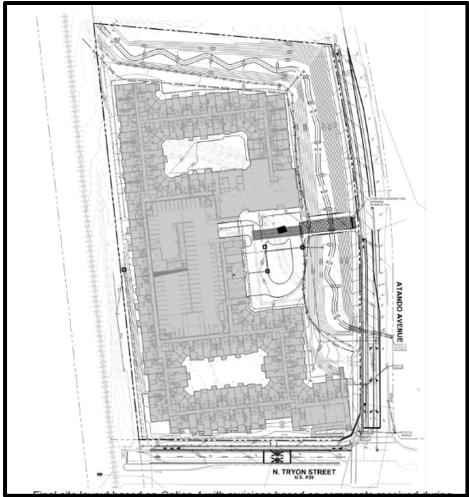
Proposed Layout of 3027 North Tryon Street Residential Development
